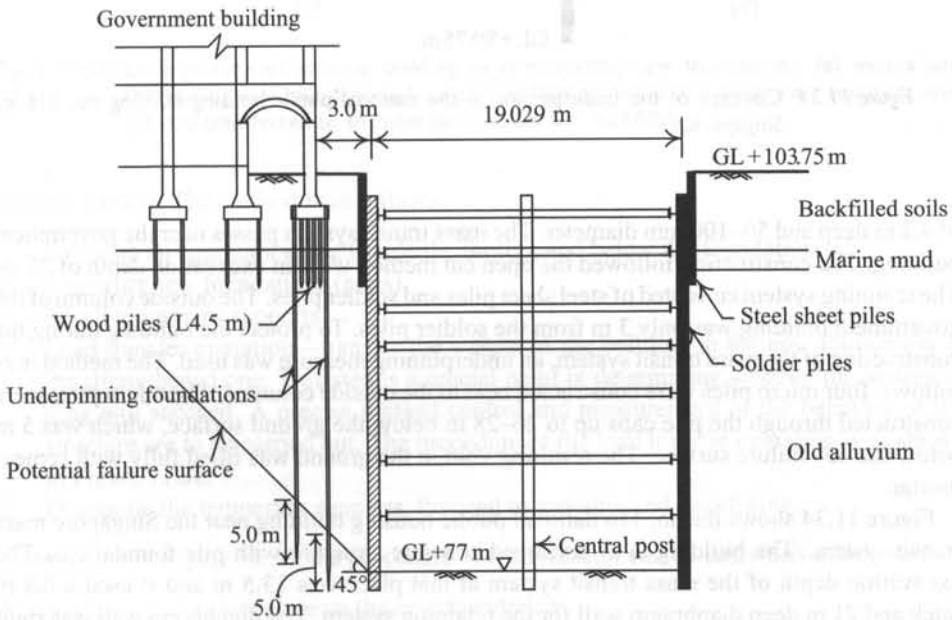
Underpinning foundations of a government building near an excavation of Singapore's mass transit system.
